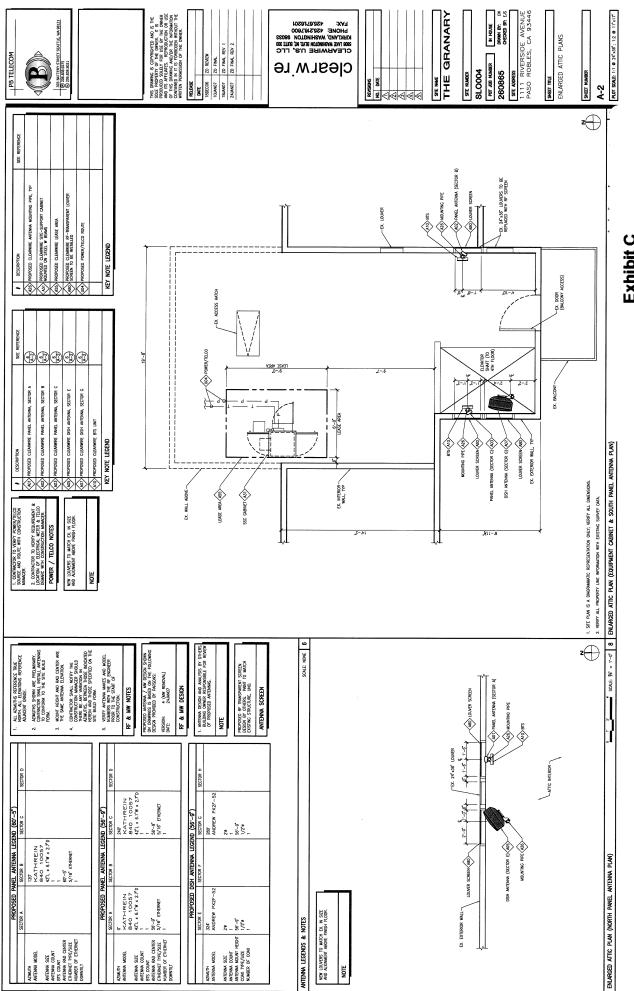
Exhibit C Floor Plans CUP 07-002 (Clearwire)
